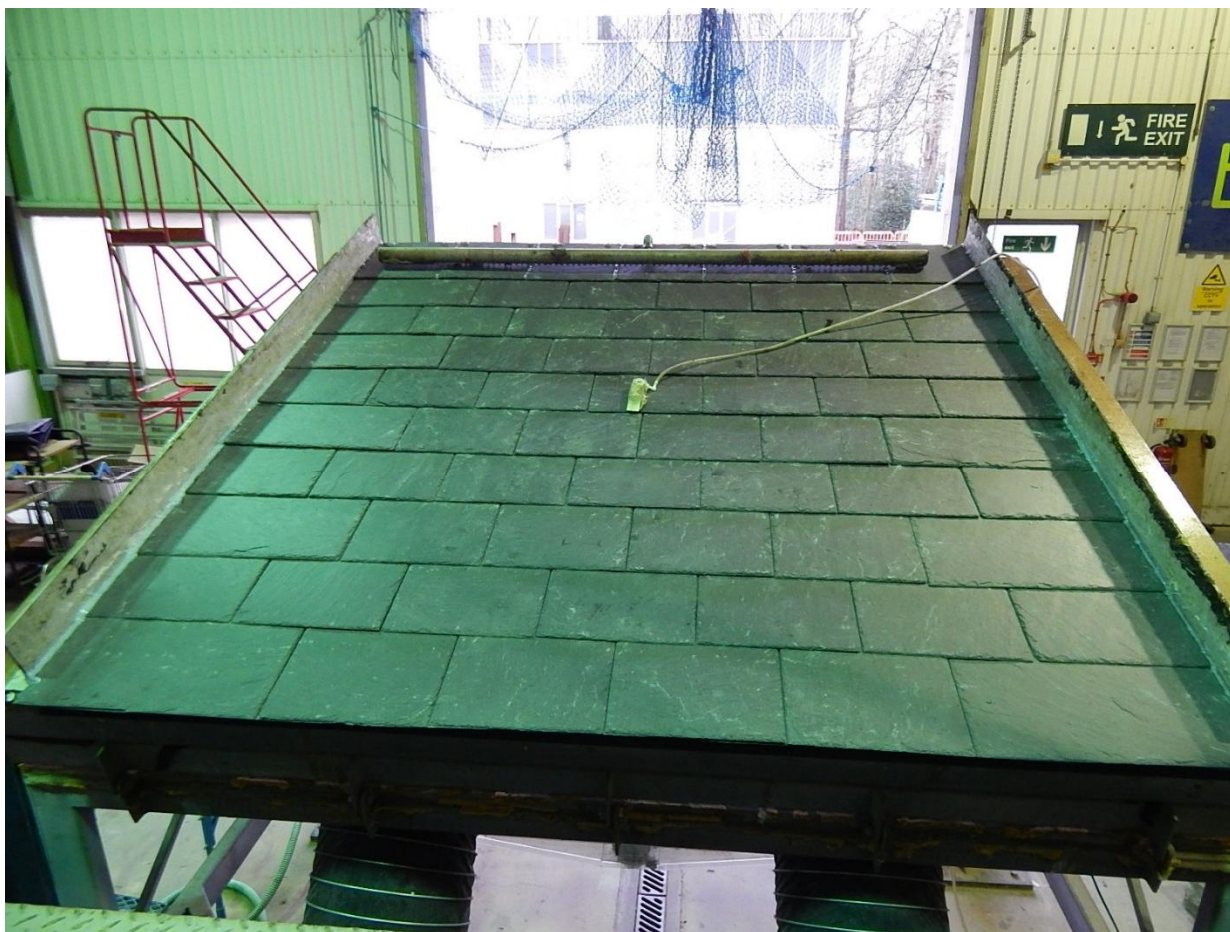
View of the Siga 65 Slate installed on the BRE test rig
